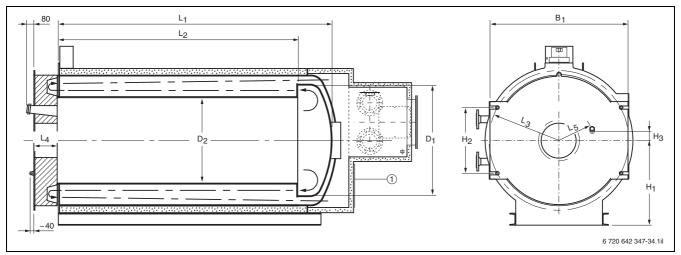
Combustion chamber dimensions Logano plus SB825L LN, boiler sizes 4250 to 17500 (dim. in mm)
